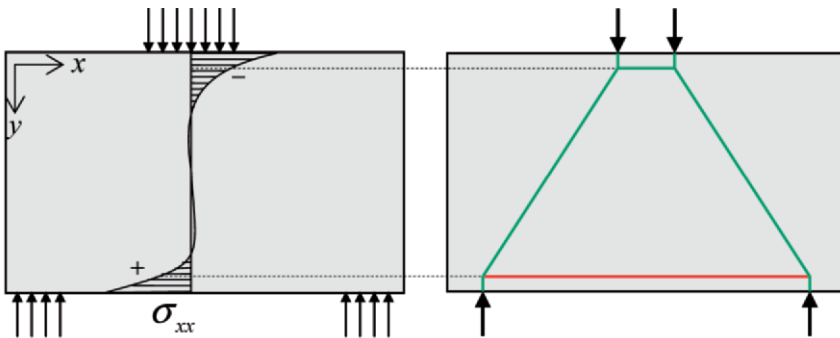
Foundation block. Stresses and strut-and-tie scheme.
